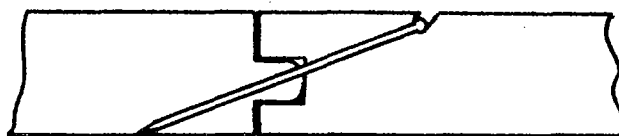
Skew nail through the tongue and groove of adjacent boards.
